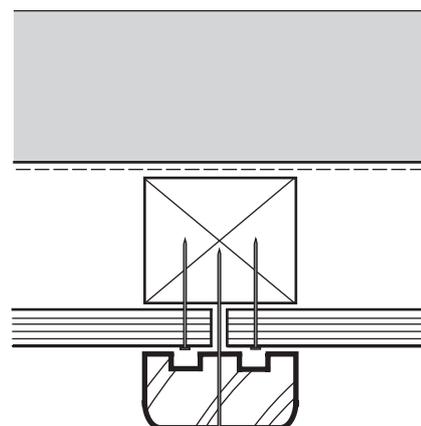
External cladding joint sealed with non-setting sealant, backed by foam breaker strip, and with timber cover strip to the joint
